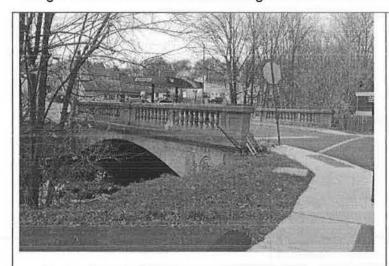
Pennsylvania Avenue Bridge, carrying Pennsylvania Avenue over Martin's Creek, facing west.
